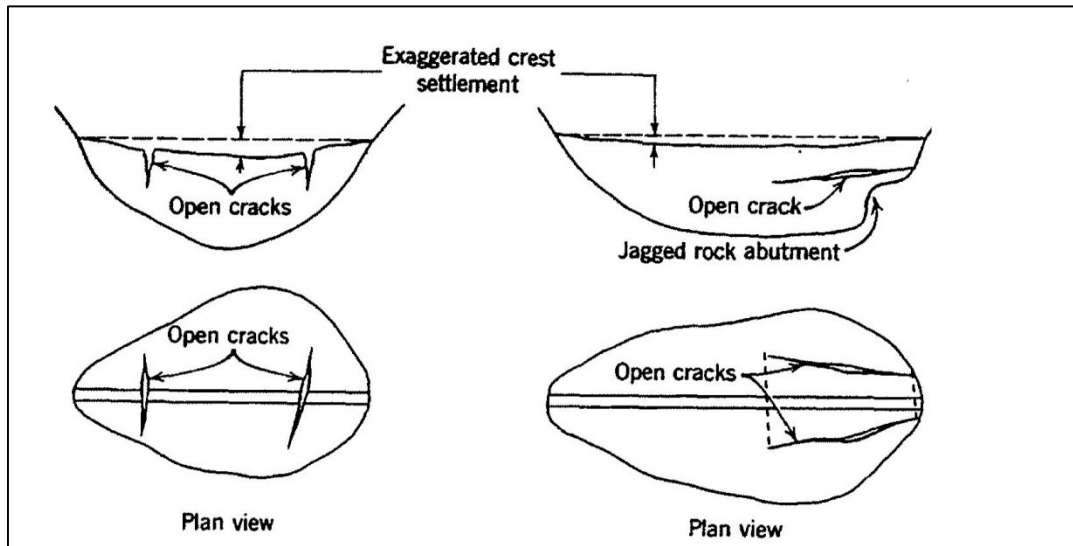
Examples of transverse and longitudinal differential settlement cracks.
